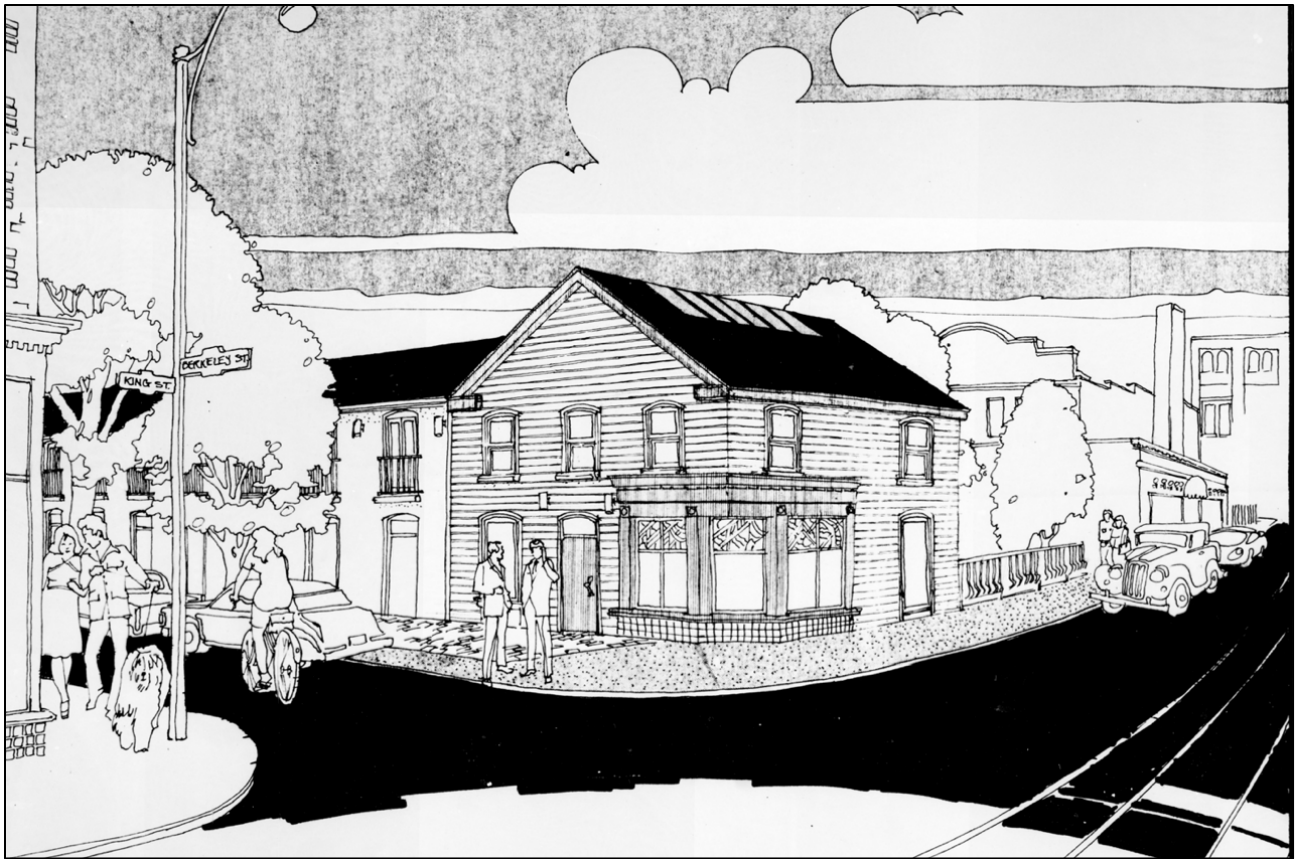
Perspective drawing of 302 King Street East from the 1980 application to renovate by LZA Architects. Toronto Building Records.
